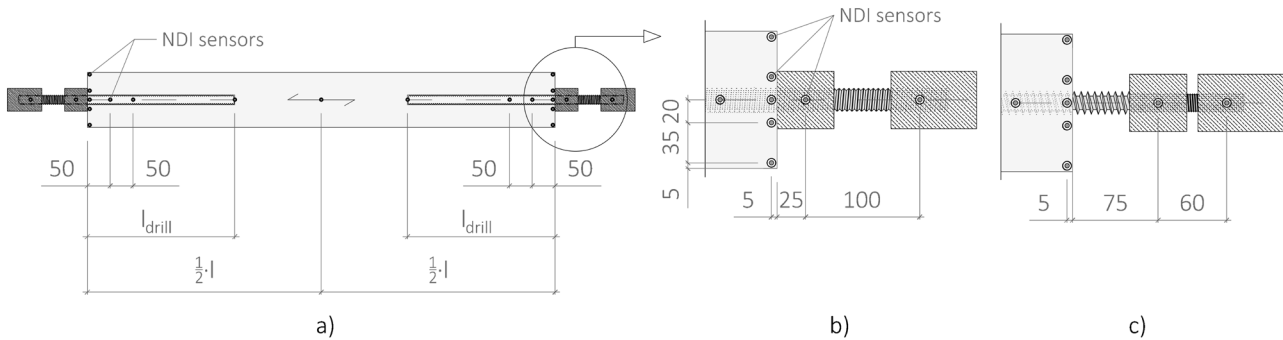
Sensor layout for the optical 3D measurement system. a) Sensor layout on the specimens. b) Clamping detail of the Glued-in rods. c) Clamping detail of the screwed-in rods. Dimensions in [mm].
